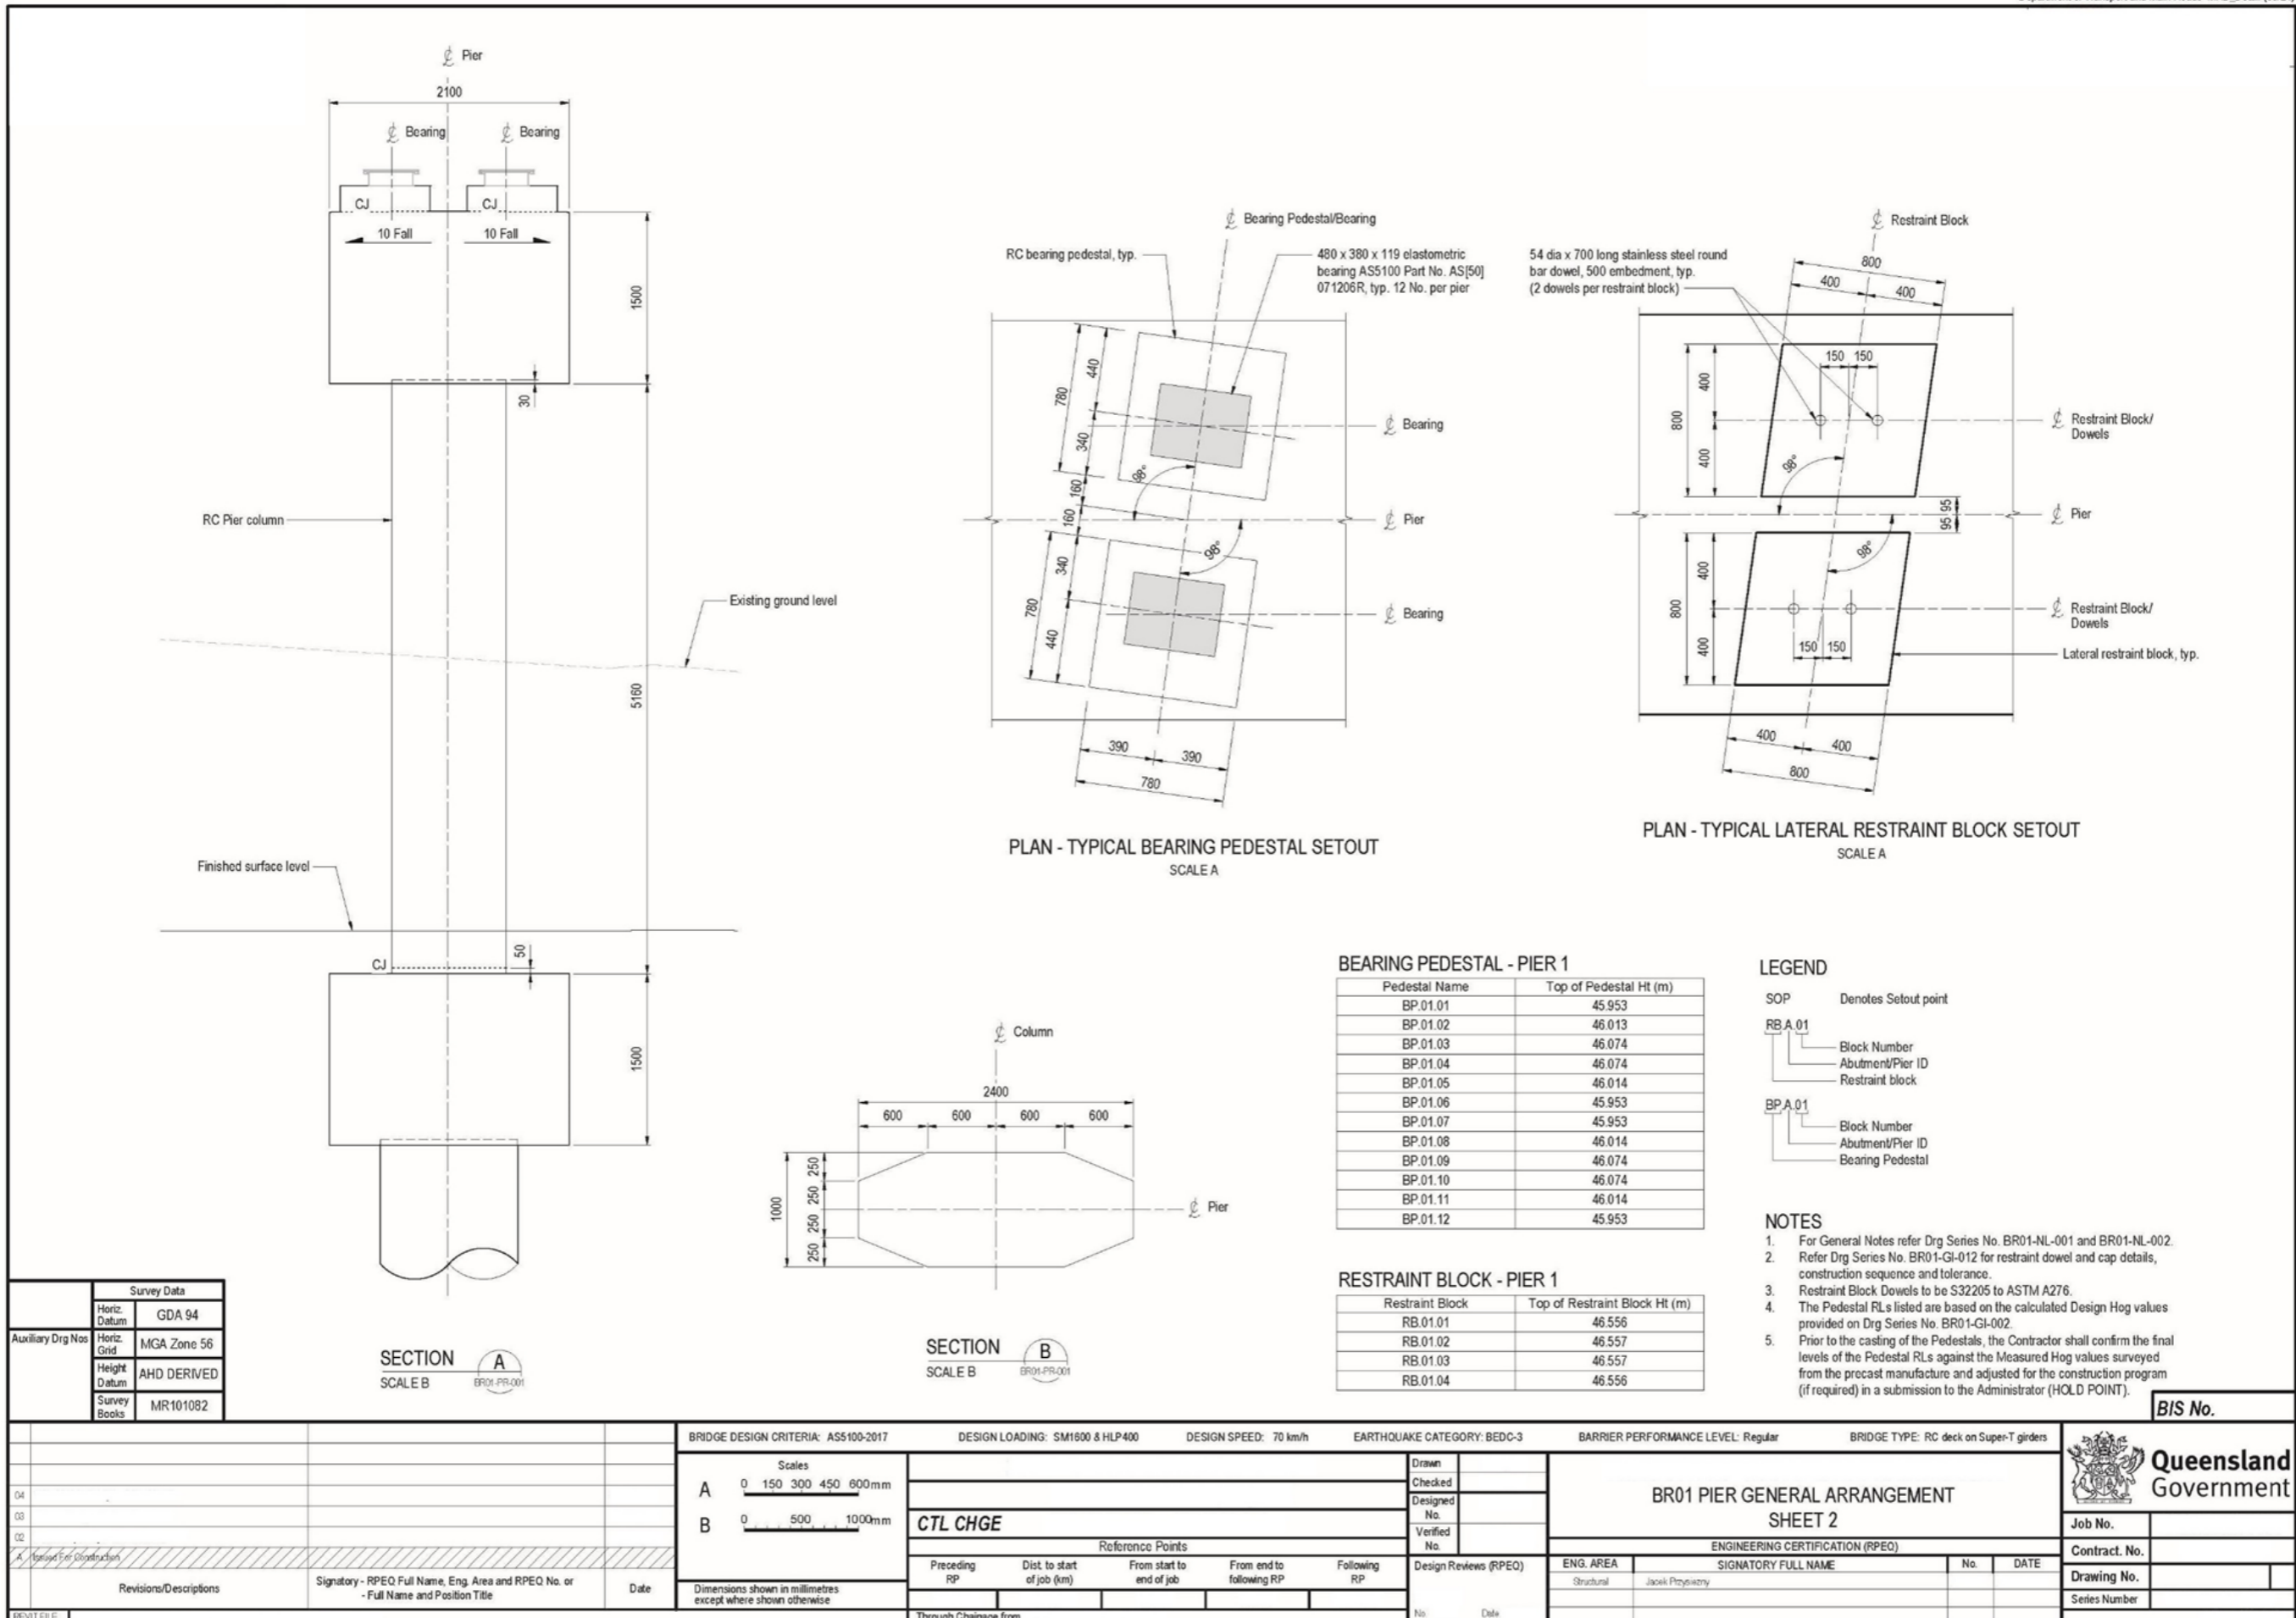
(g) - Example pier drawings for Super-T girder skewed bridge - Drawing PR-02 - concrete details
